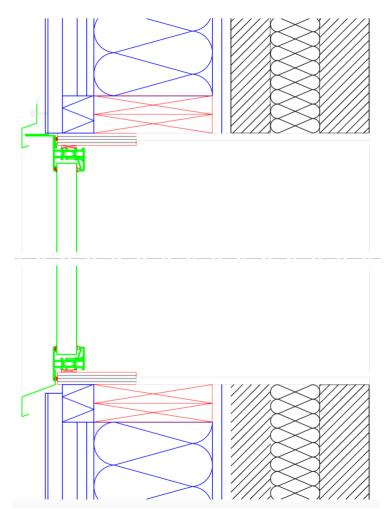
Detail drawing of the window location in the prefabricated Multi-active facade element.
